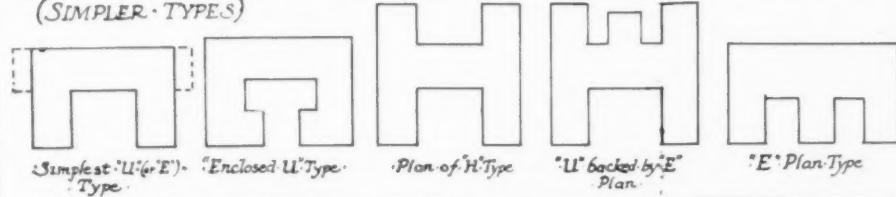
THE SIMPLER TYPE OF "OPEN COURT" APARTMENT PLANS.
